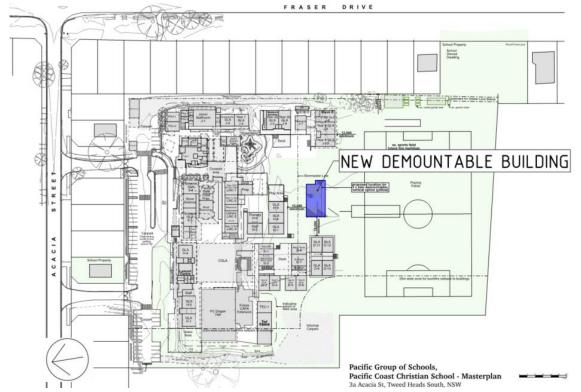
School masterplan, with the subject new demountable building location highlighted in blue.
